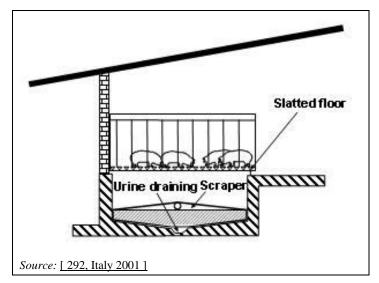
Flat deck system with a scraper under a fully slatted floor
